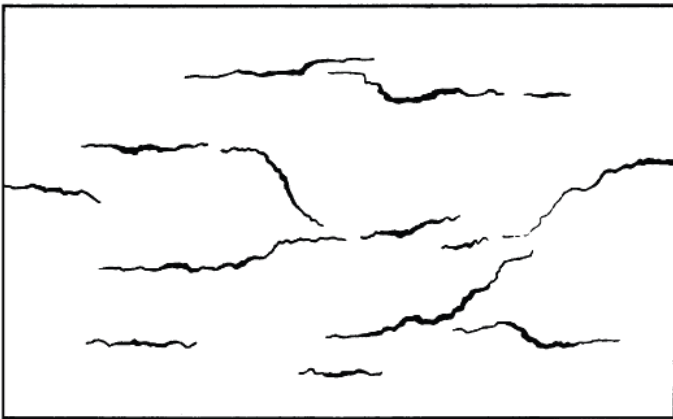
Typical plastic shrinkage cracking (Price 1982)
